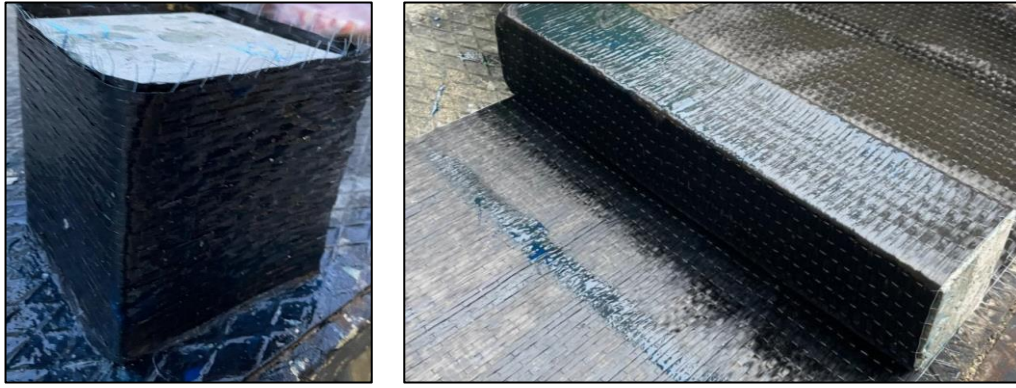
Cube and prism concrete specimens wrapped with CFRP.
